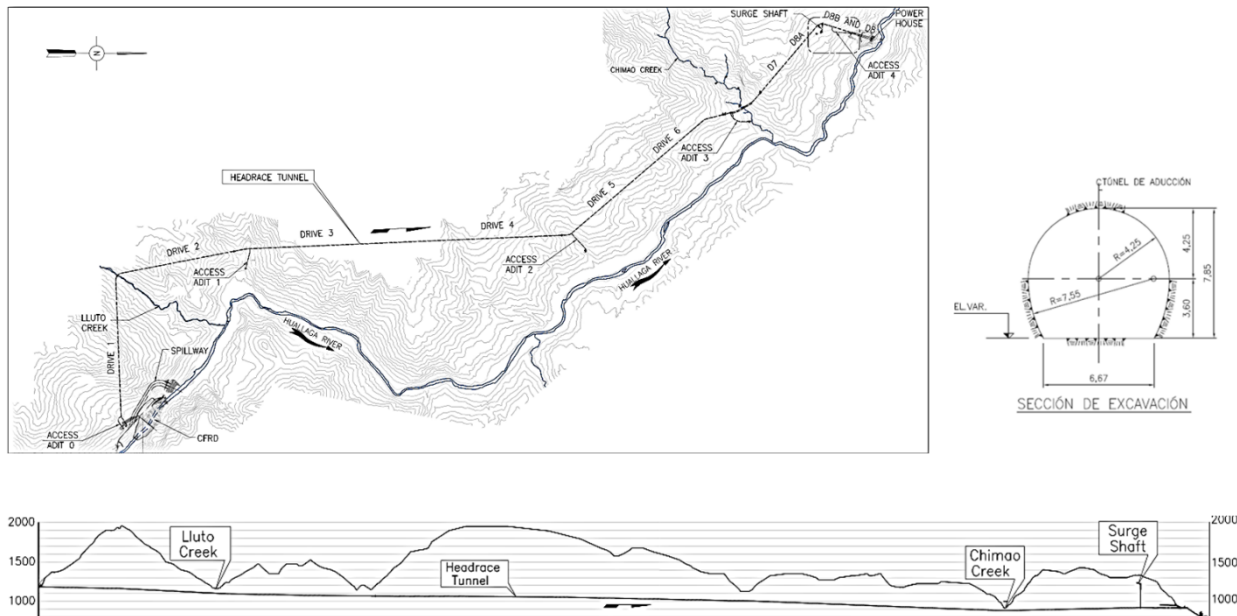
Plan view, cross section and longitudinal section of the headrace tunnel
